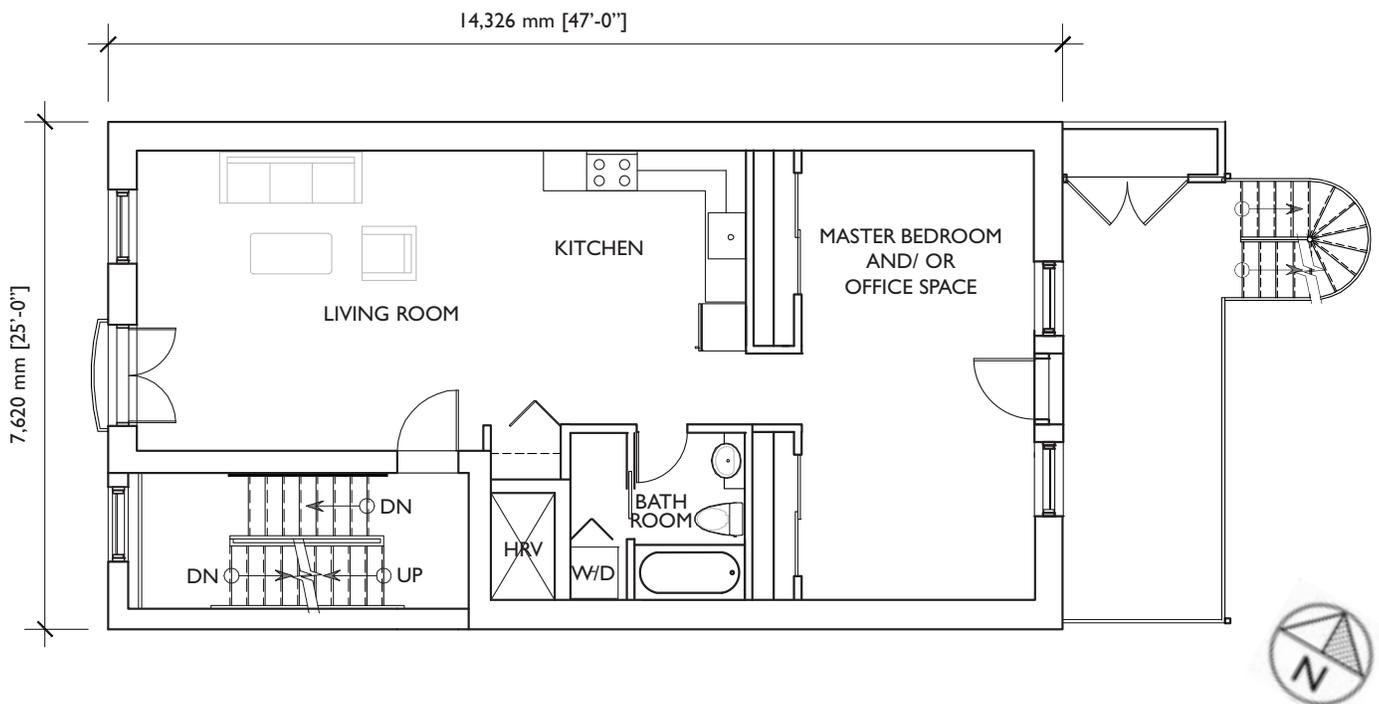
Alternate floor plan of an Abondance Montréal: le Soleil home
